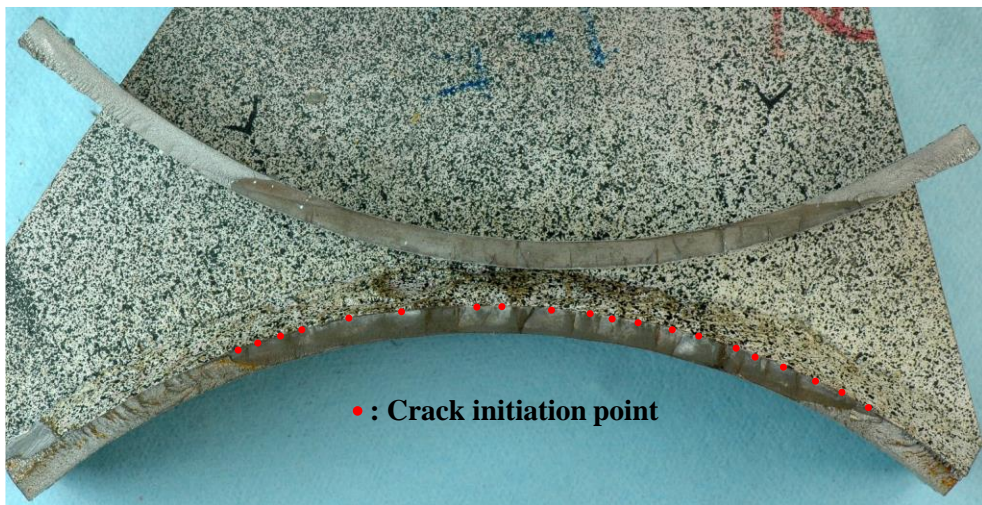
Fatigue fracture surface and identified crack initiation points in Type I-5 Pole
